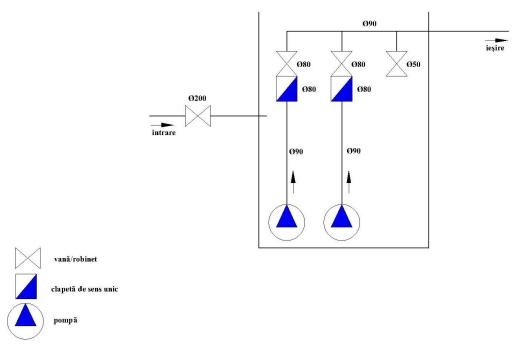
Hydraulic Scheme with existing equipment of WWPS-4 – Ungureanu 15
